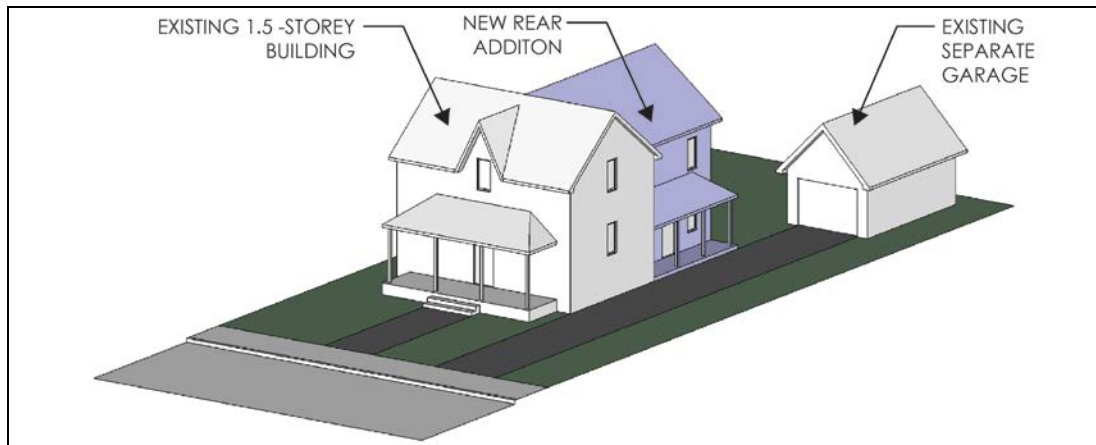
Example of new rear 1.5-storey addition for building on a *contributing* property
